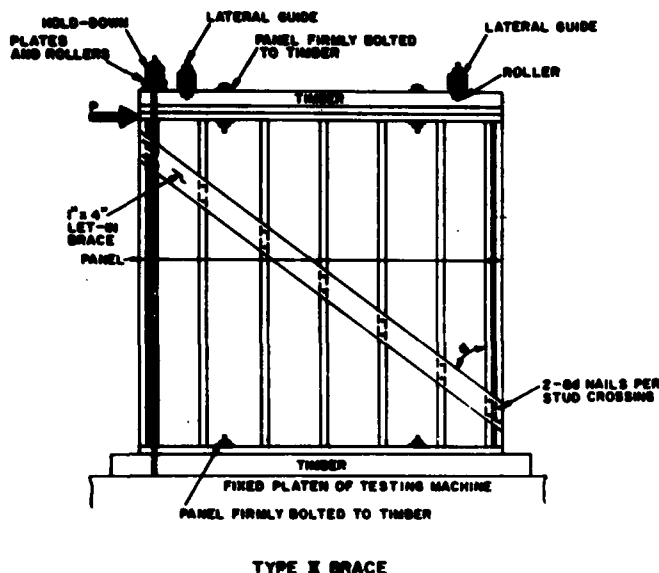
A type II brace provides racking strength solely through the resistance of the fasteners. A type I brace loaded in tension, or a brace improperly installed (as shown), exhibits lateral nail failure.
